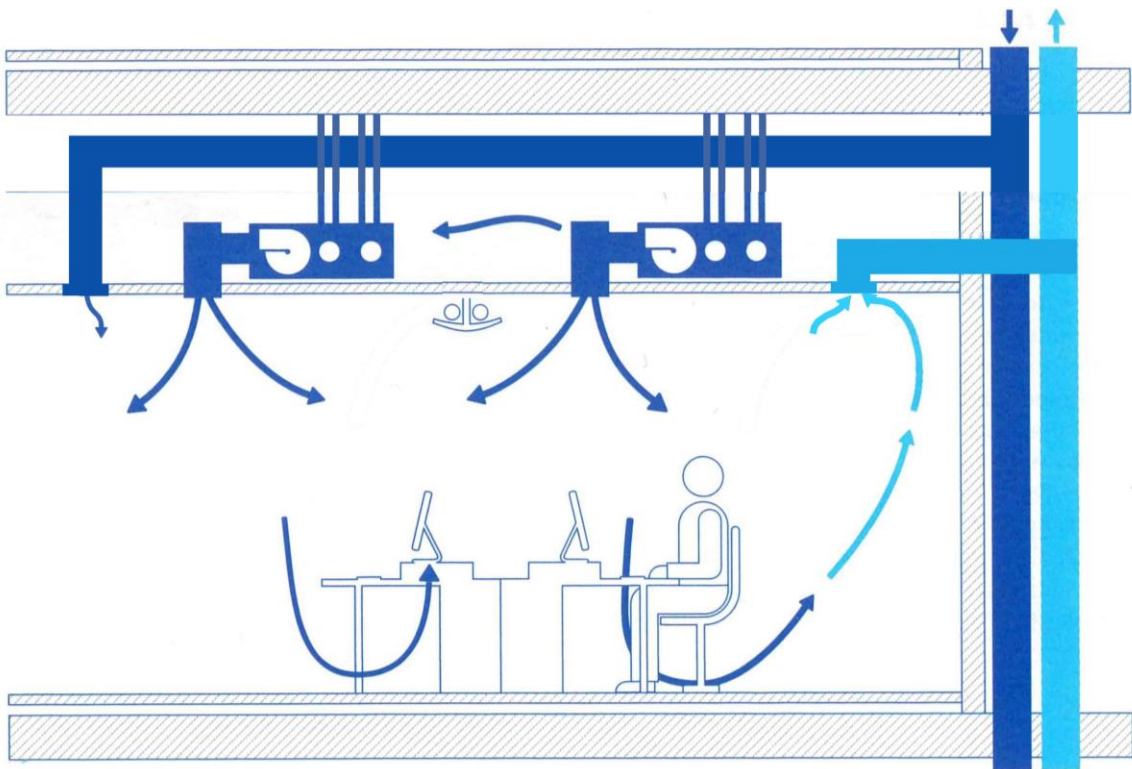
Option 2 for FCU airside connections (outside air supply and extract both ducted to ceiling diffuser / grille)
